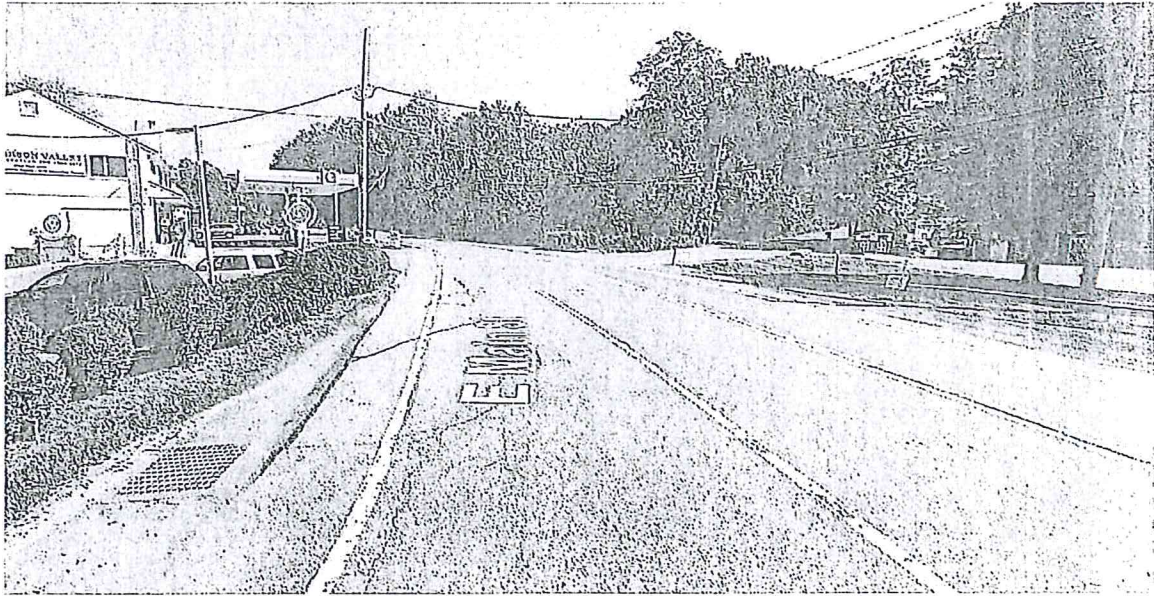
East Main Street east of Mahopac Street, within wetland A-4 buffer, facing east.
